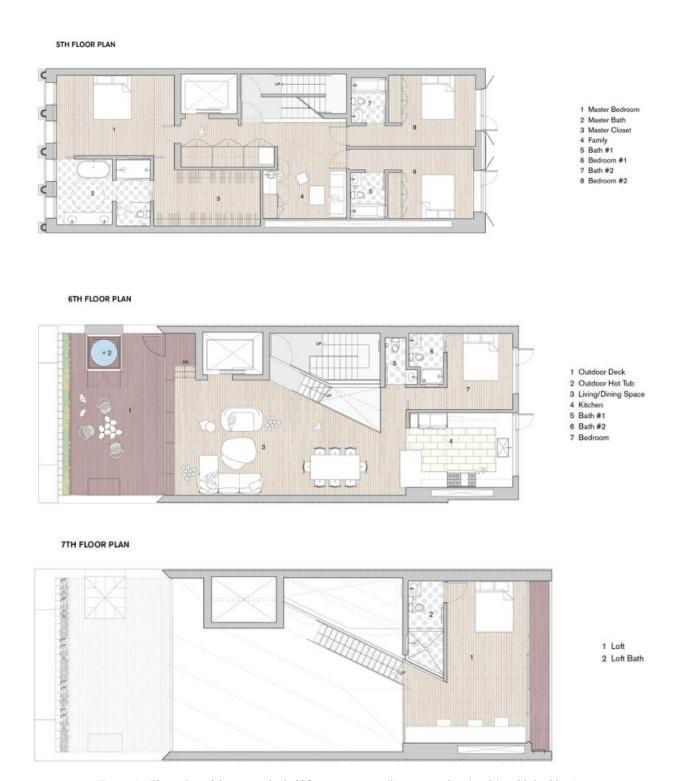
Floor plan of the two and a half floors extension (Source: work.ac/work/stealth-building)
